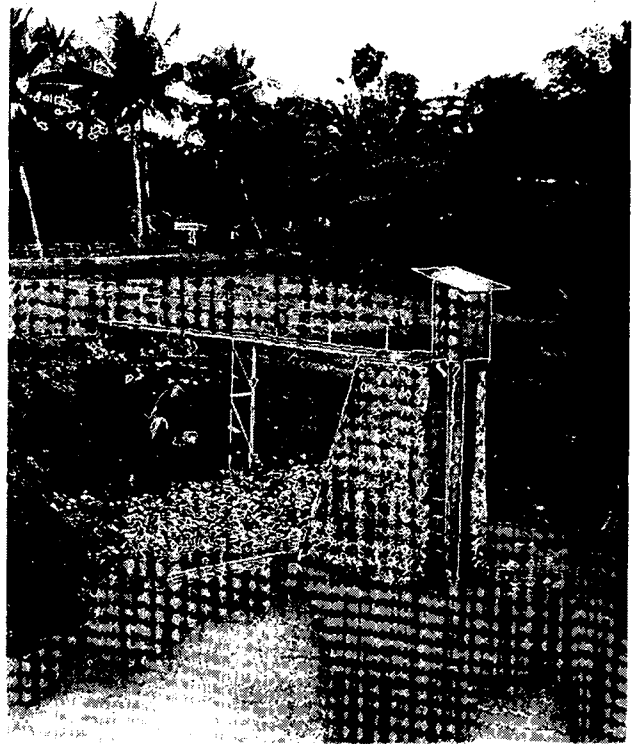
Water level recorder station; stilling well made of steel pipe, house made of sheet iron, supported by specially designed masonry pier, bank-protection by laid stones (Seraju River at Banjumas, Java, Indonesia).
